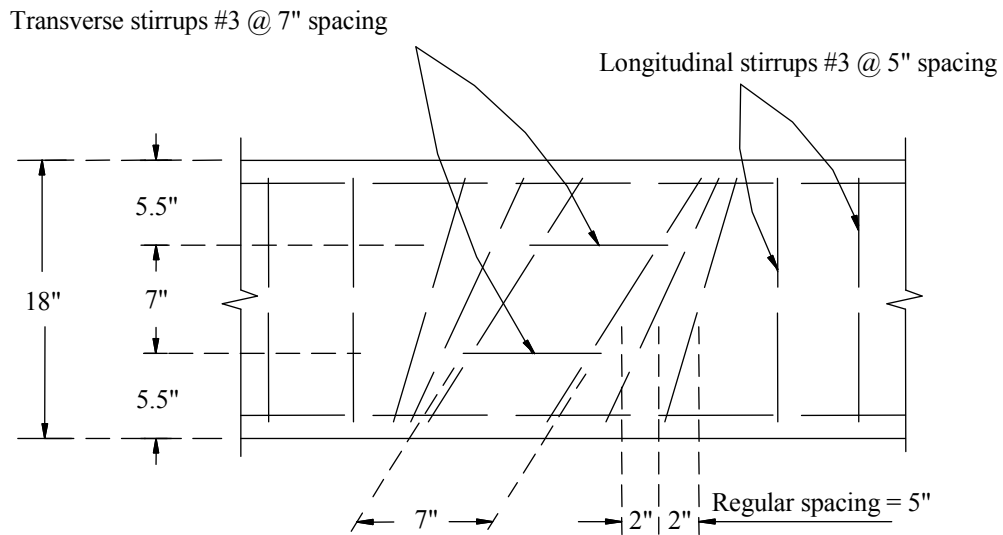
Reinforcement of interior box-beams at the intermediate diaphragm.
